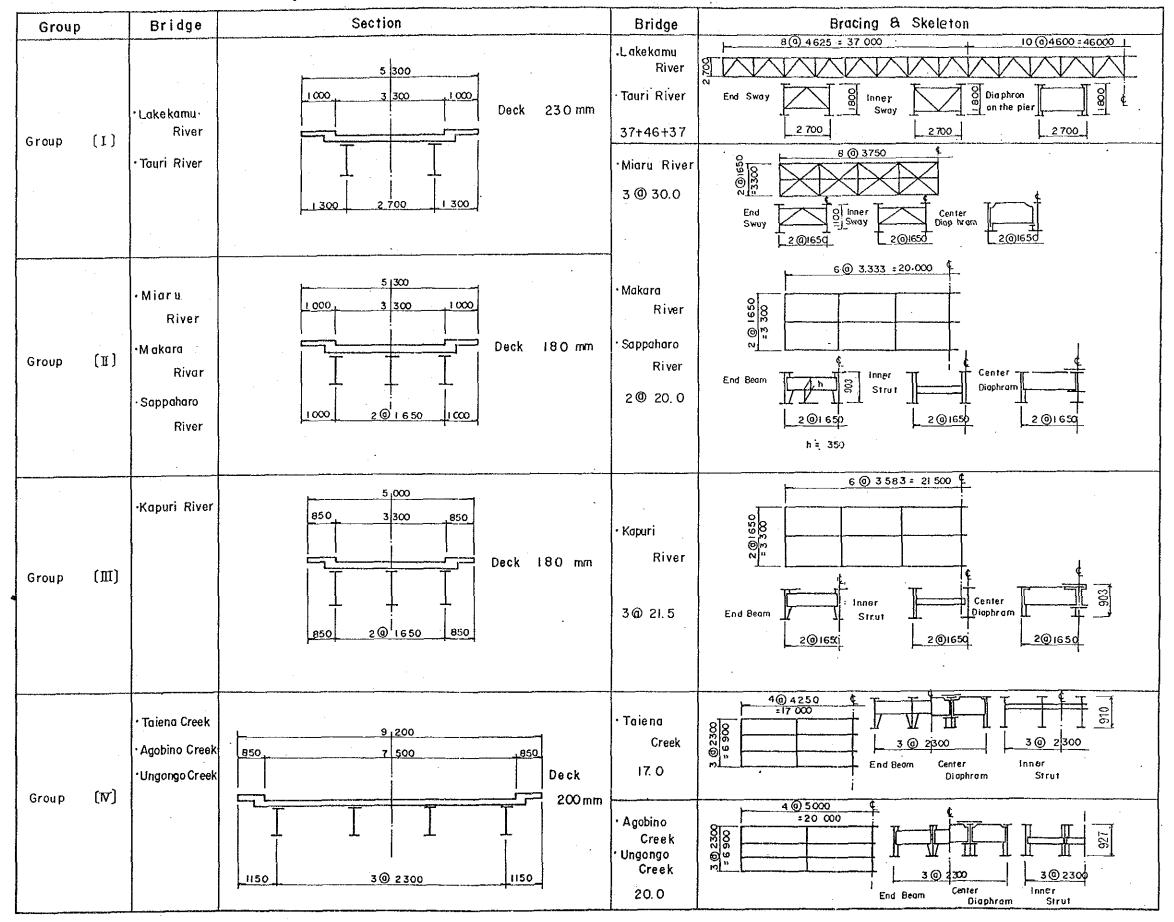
DETAILS OF PLATE GIRDER BRIDGE
